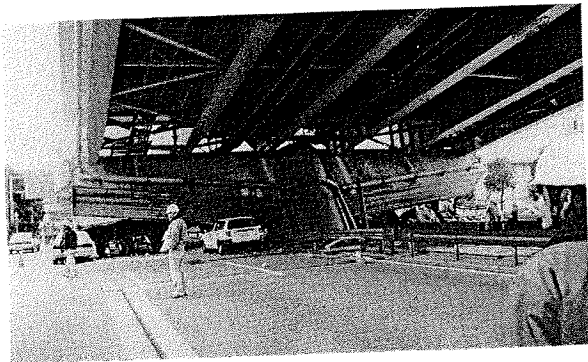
Failure of Reinforced Concrete Pier, Takashio
